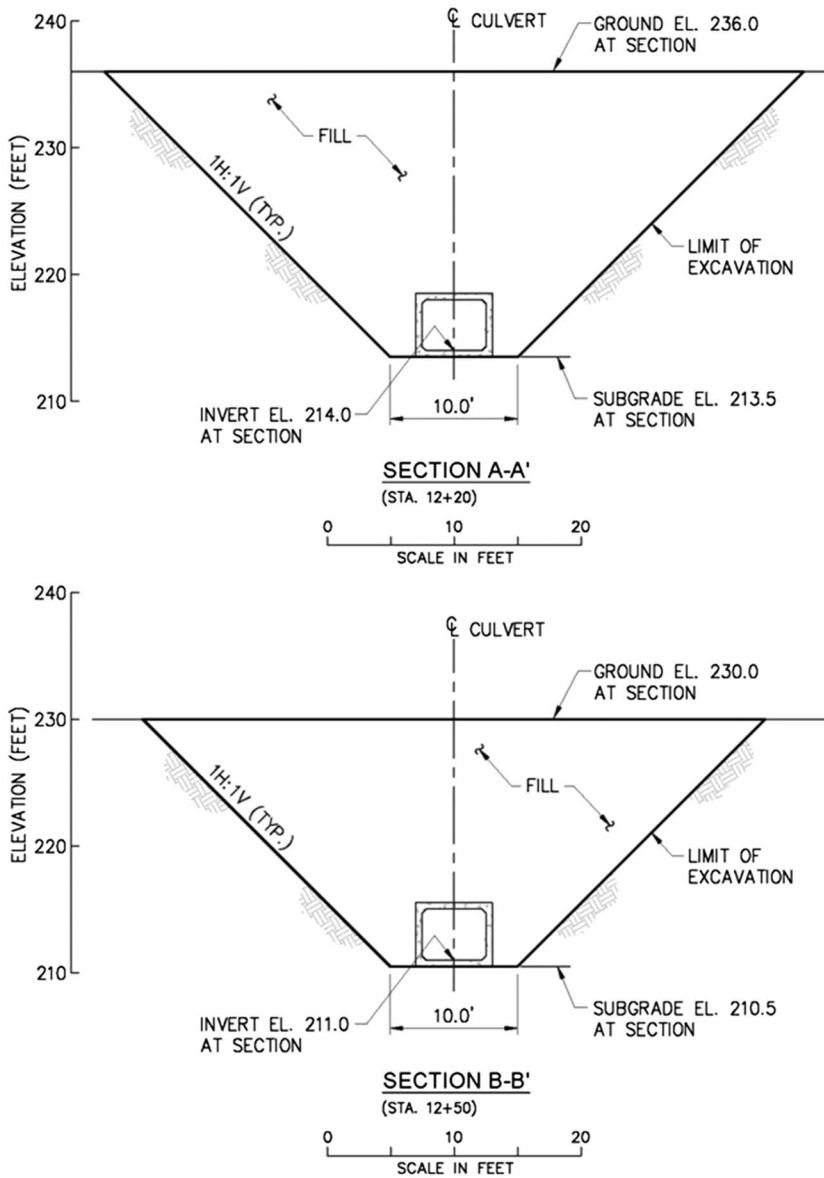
S-4. Section A-A' and B-B' of Box Culverts
